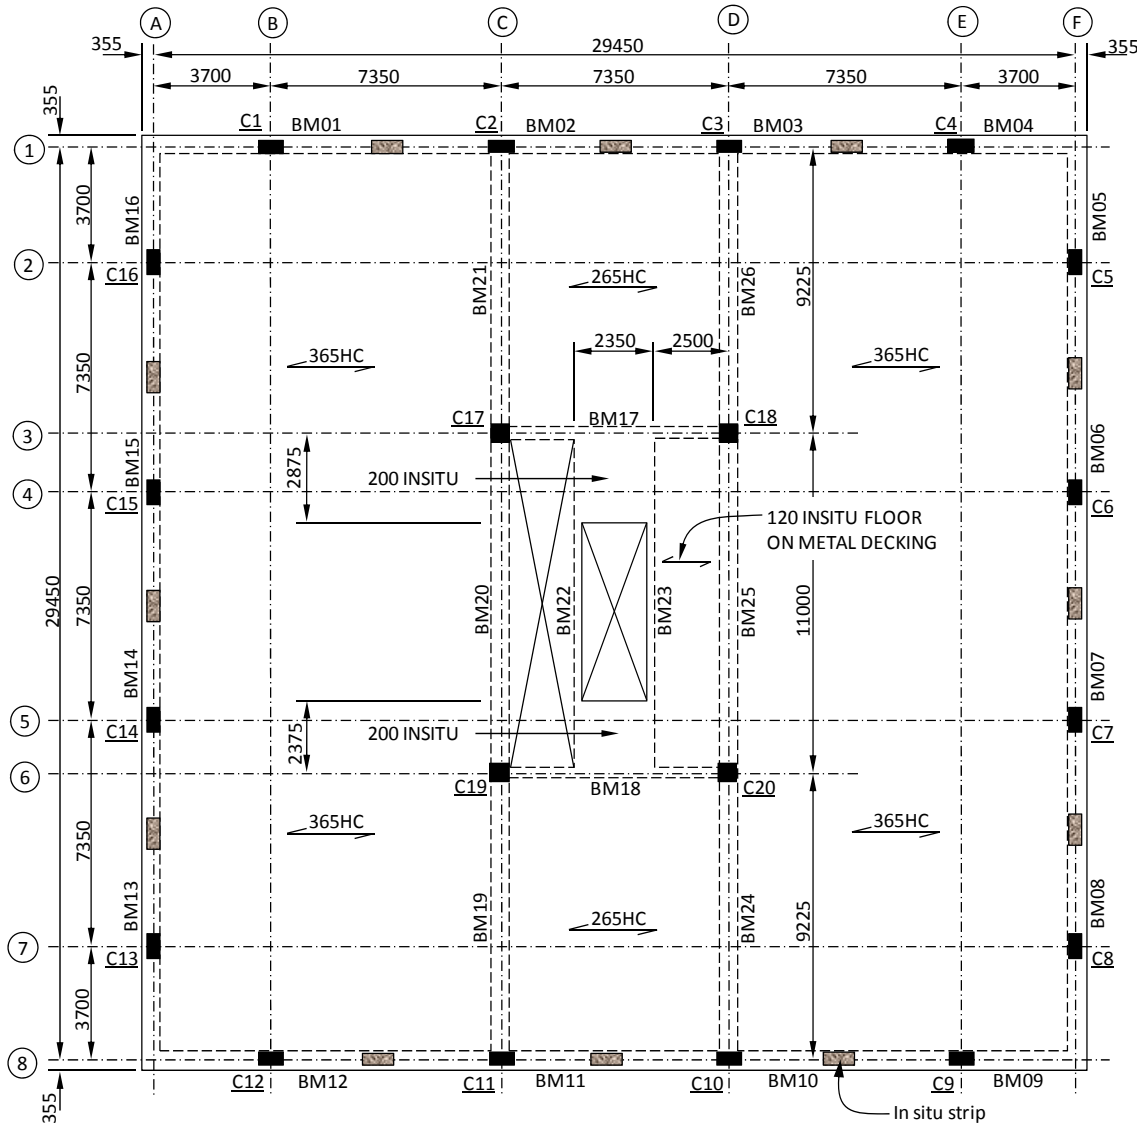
Red Book Building (adapted from CCANZ, 1998) – Typical Floor Plan
